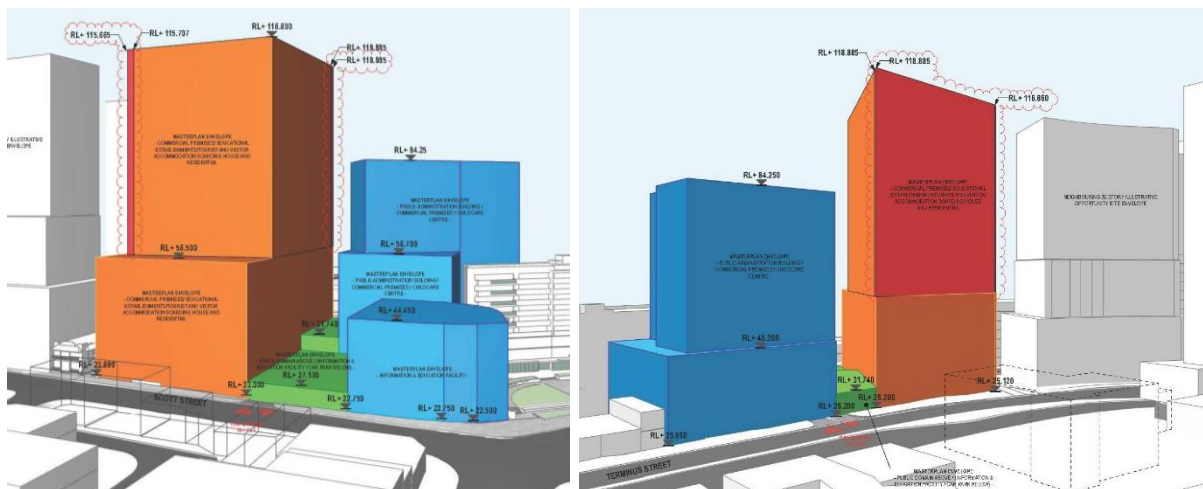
Amended envelope perspective from north (left) and south (right) with proposed modification shown in red cloud
